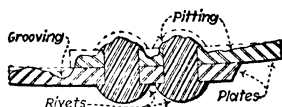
Grooving of plate and pitting of plate and rivets.
